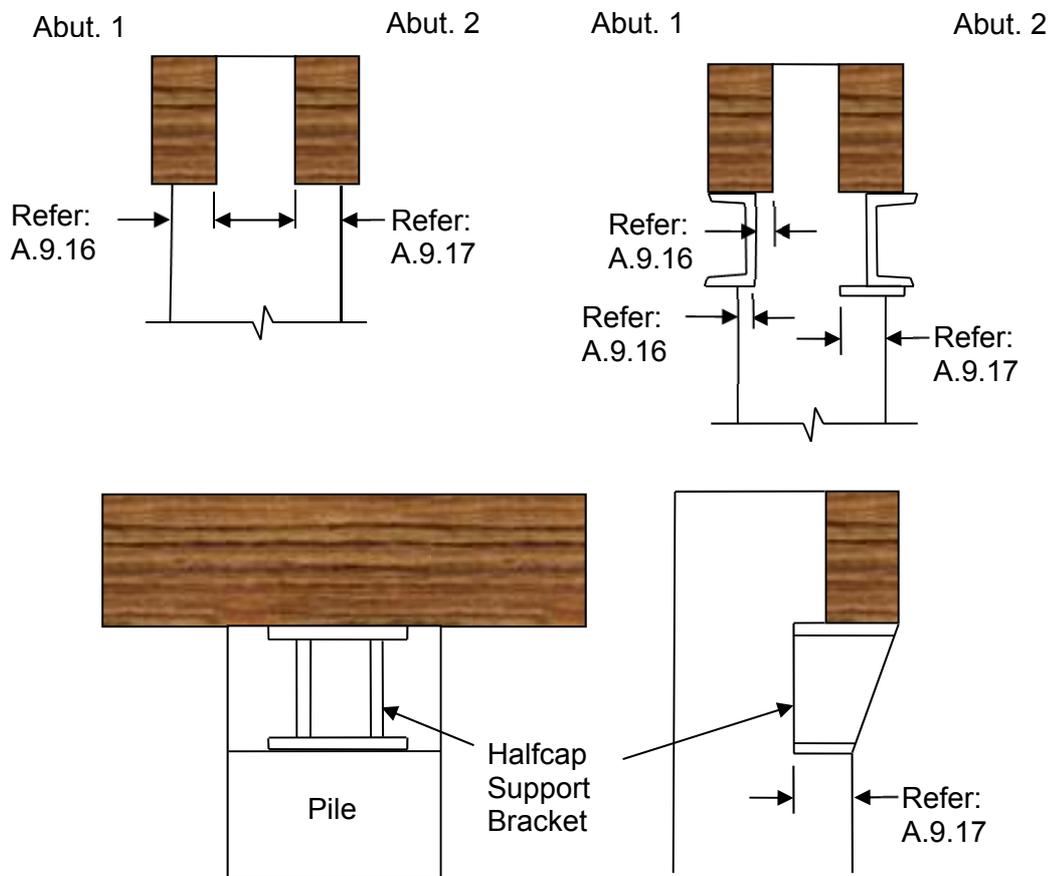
HALFCAP BEARING MEASUREMENTS
